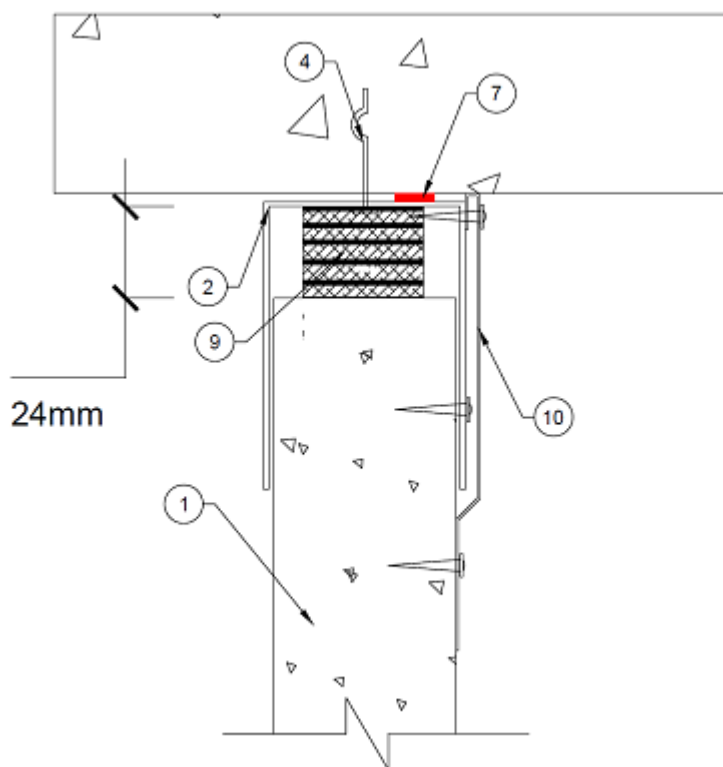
Head Detail 2 of the Wall with Minimum Gap Size
